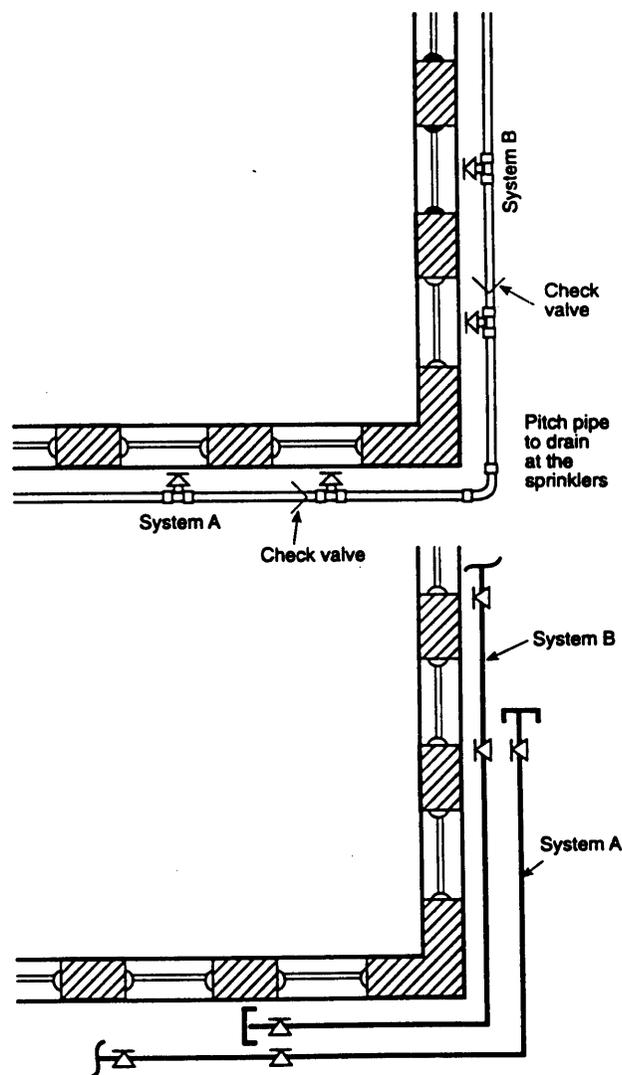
Arrangement of check valves. Top: typical. Bottom: alternate.
